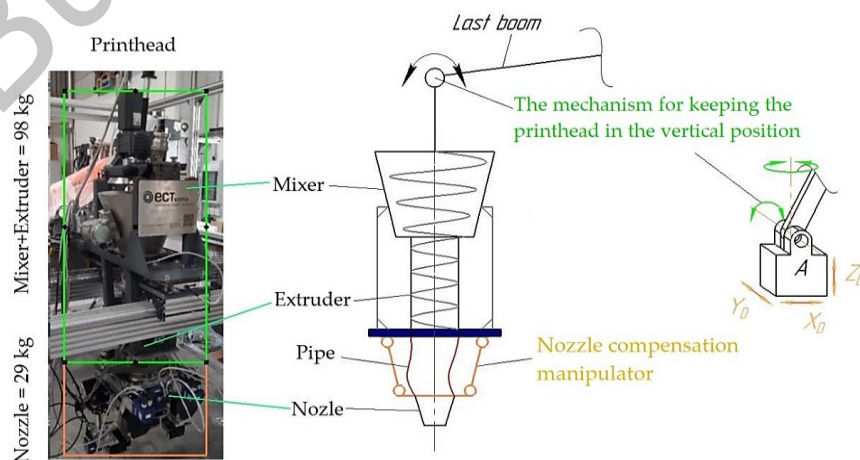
PrintHead and installation options for the mechanism for keeping the PrintHead in the vertical position and nozzle compensation manipulator.
